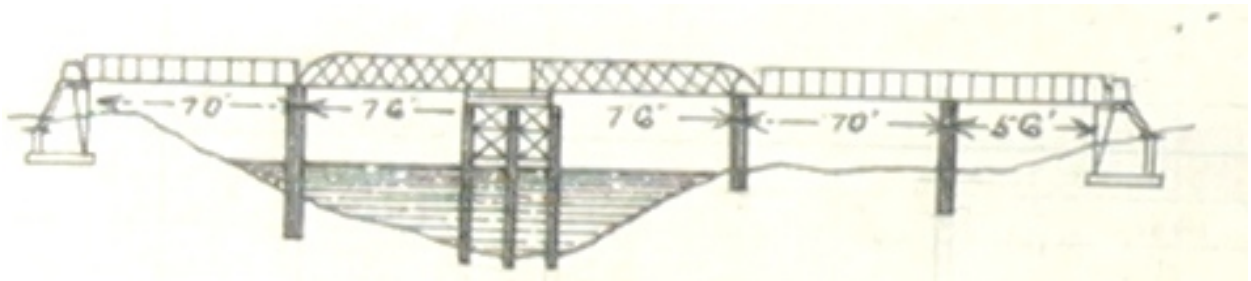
Lane Cove Bridge at Figtree type elevation (Source: Dare, 1896)
